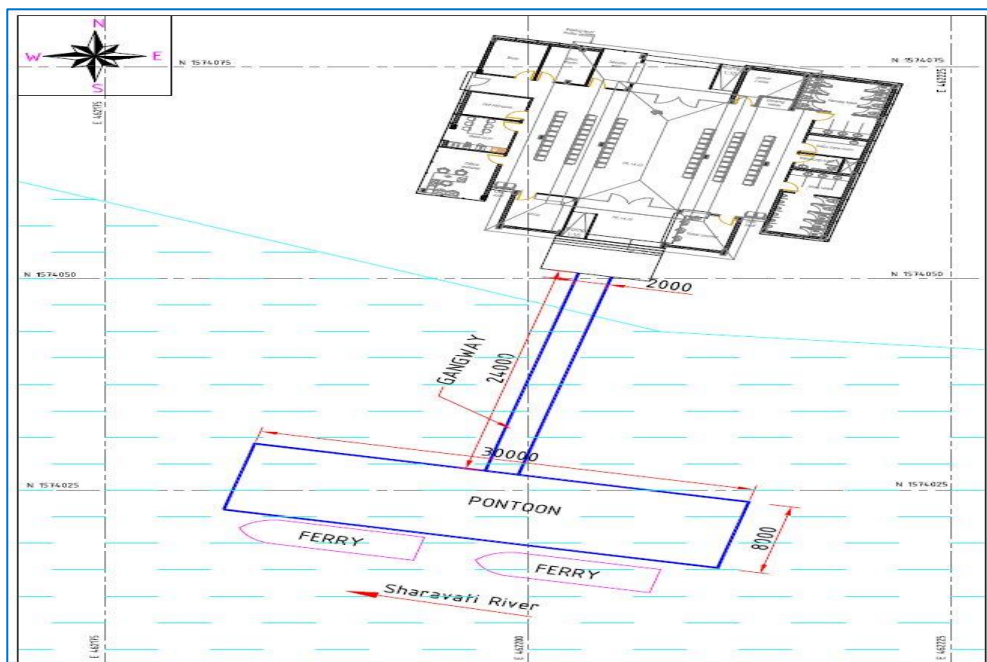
Overall site plan of proposed ferry terminal.
